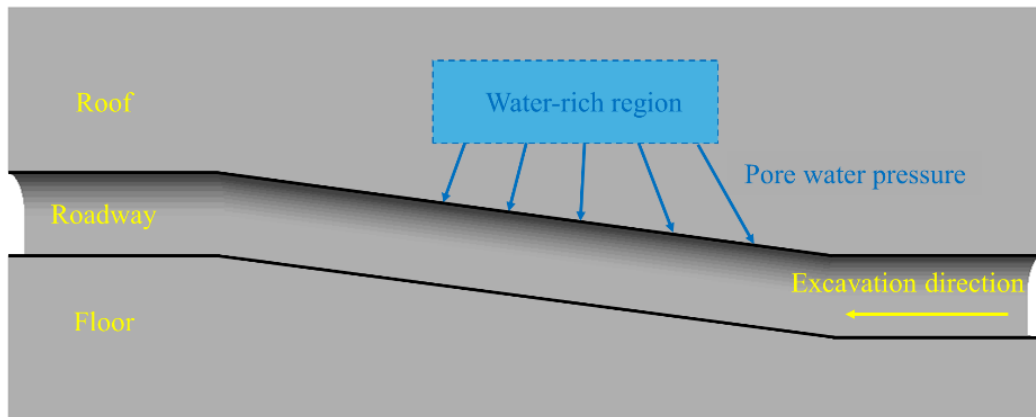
Distribution of tunnel excavation and roof water pressure
